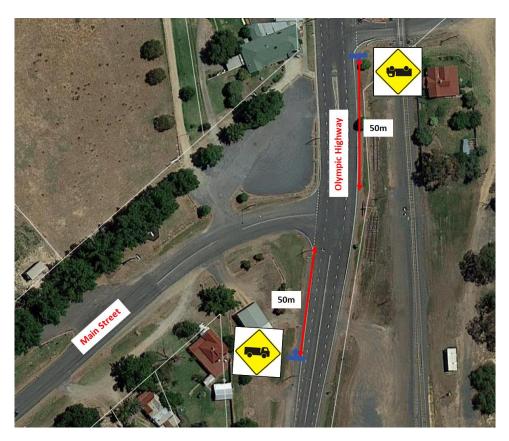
Truck crossing signs at the intersection of Olympic Highway and Main Street
